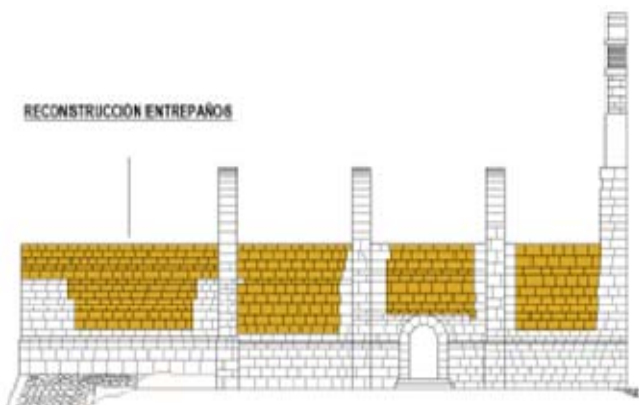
CHAPTEL WALL RECONSTRUCTION AS PROPOSED INTERVENTION
